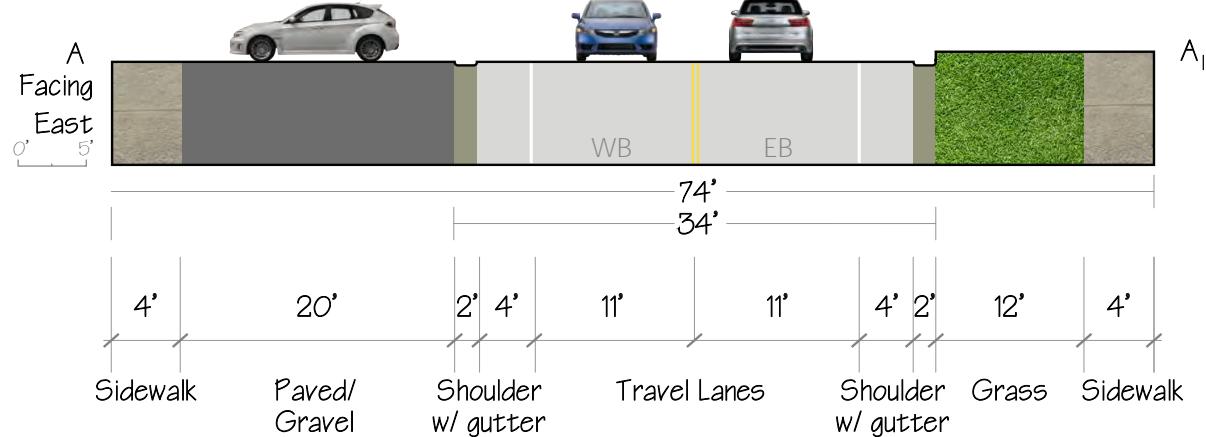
Hamlet core area, proposed striping and streetscaping plan
